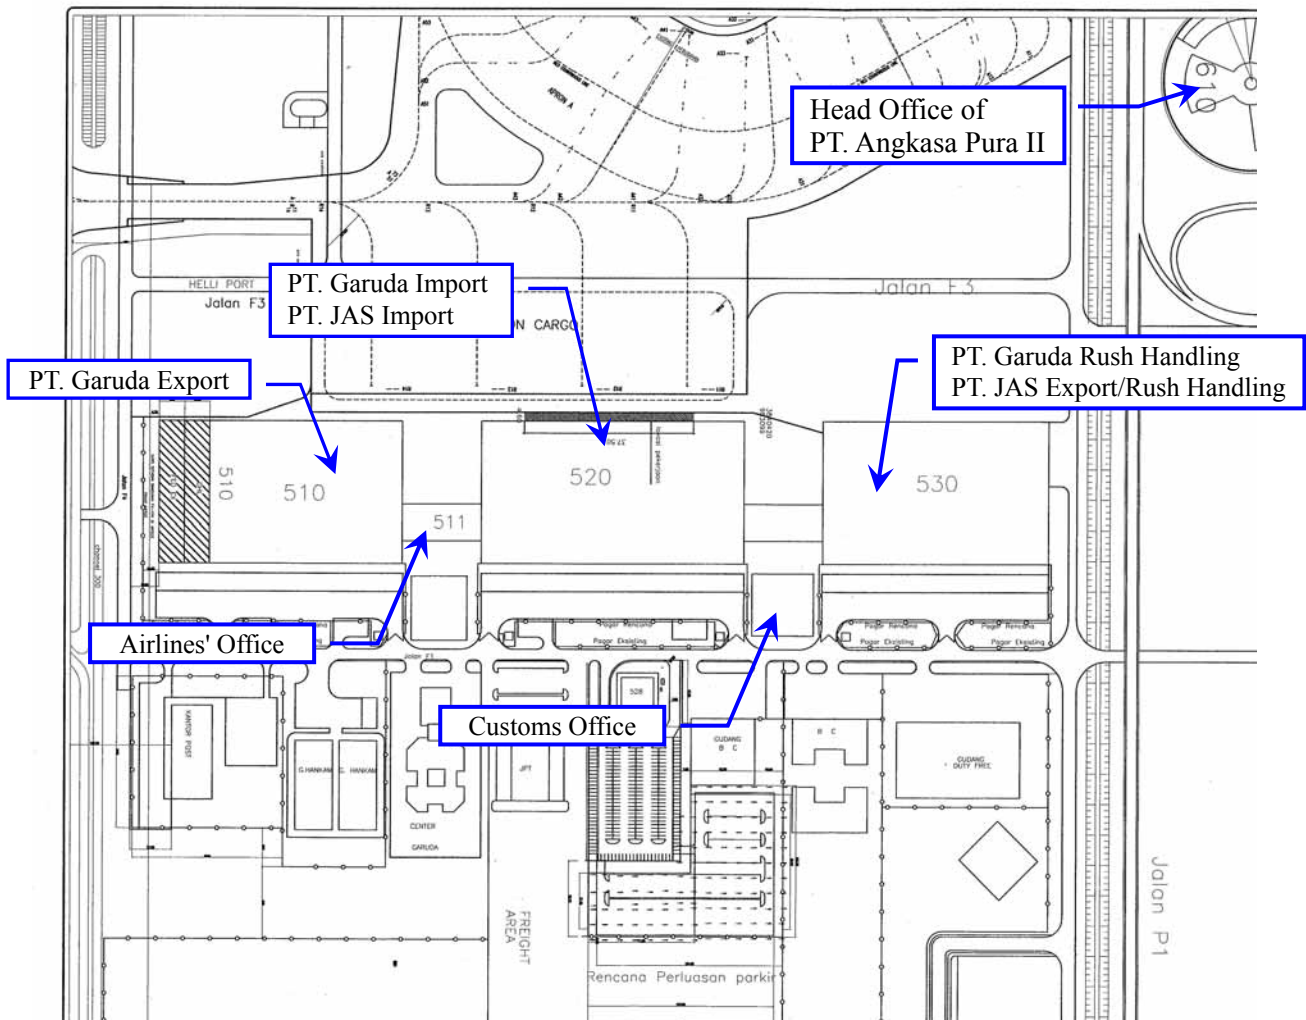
General Layout Plan of Cargo Terminal
